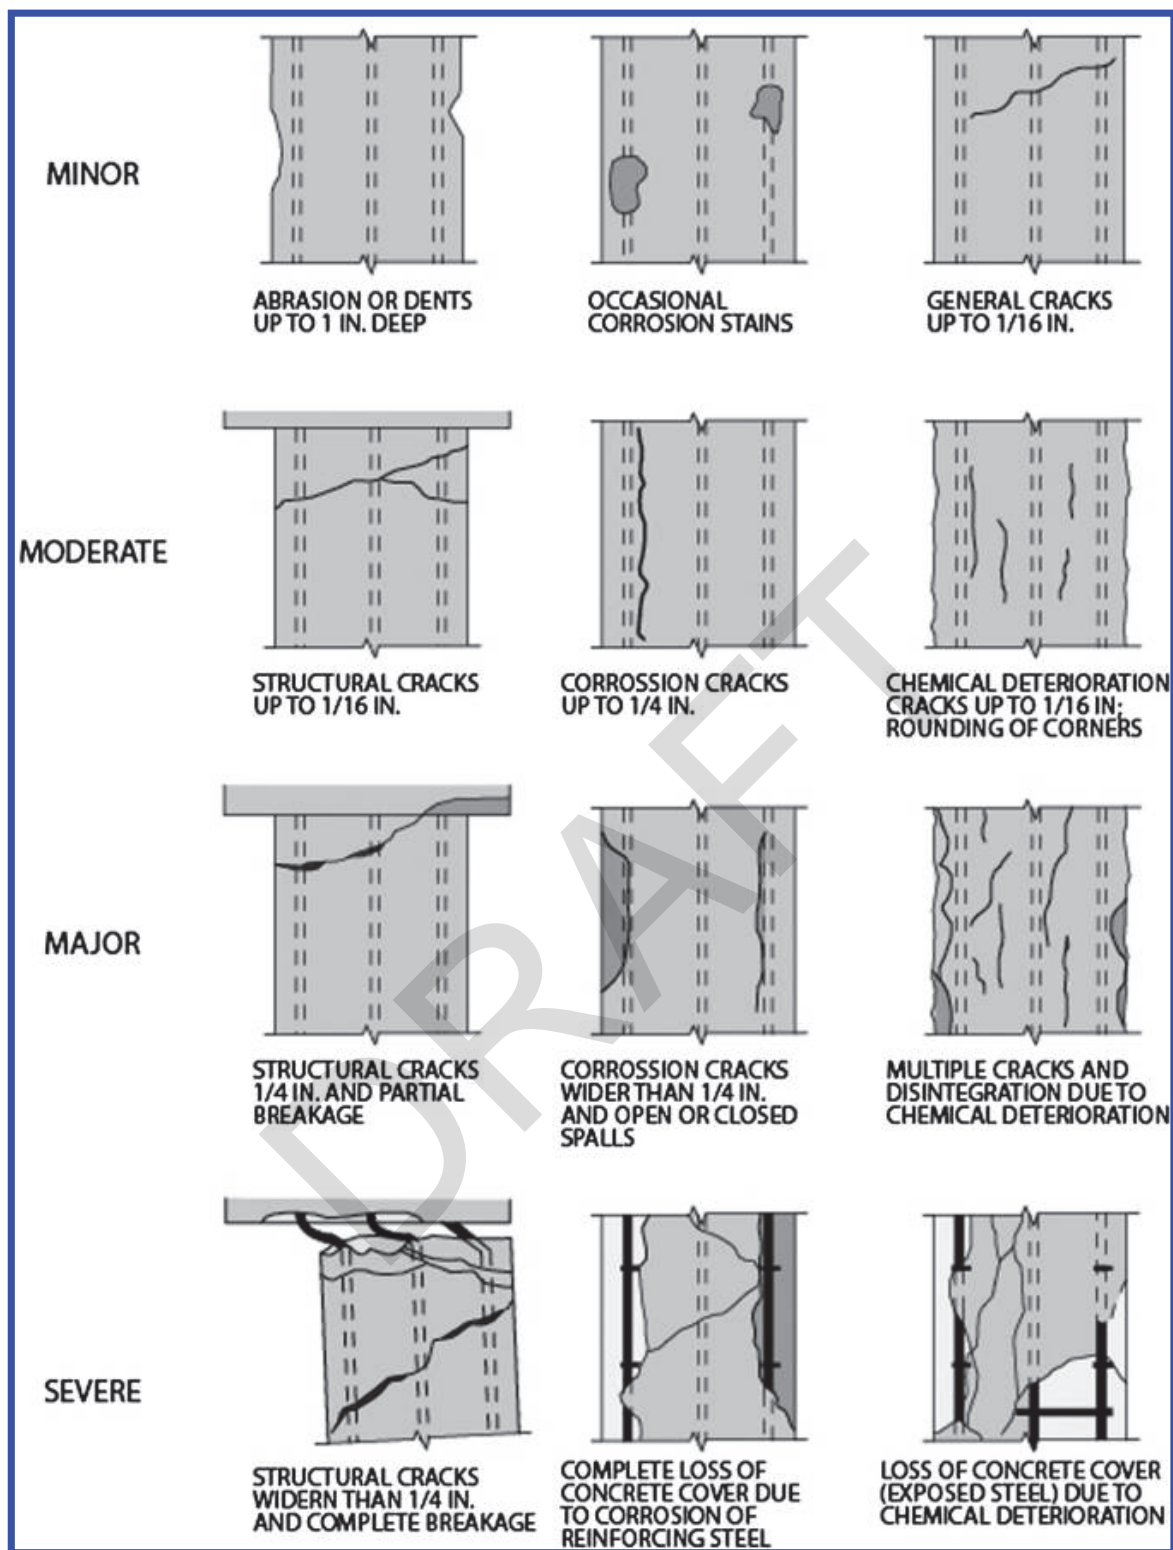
Damage ratings for reinforced concrete elements
